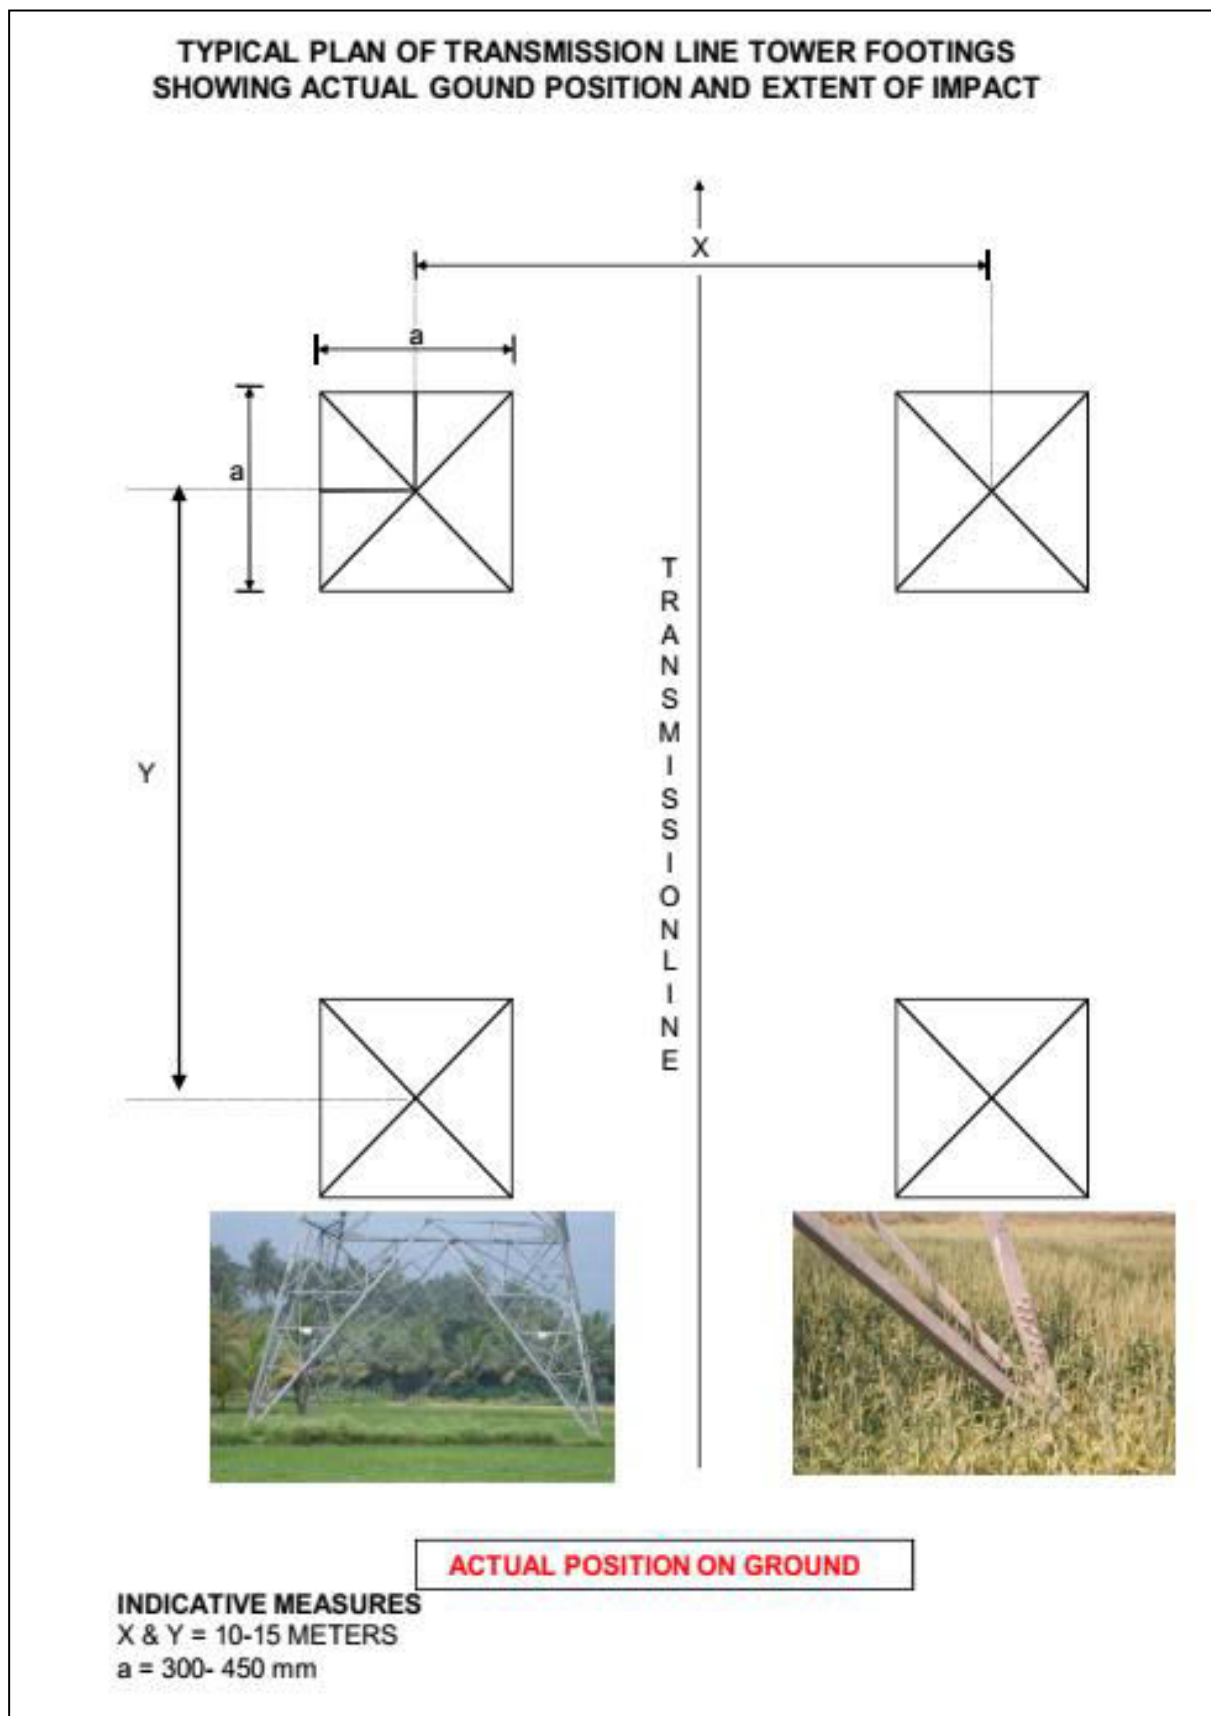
Typical Plan of Transmission Line Tower Footing
